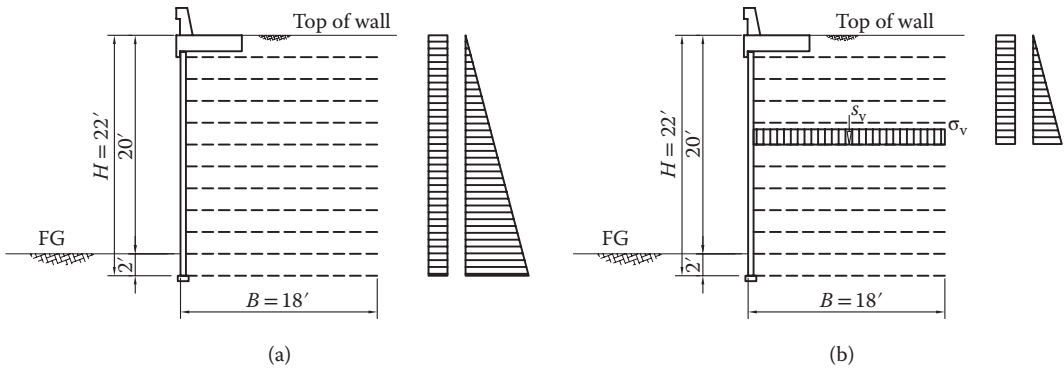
Mechanical stabilized earth (MSE) wall design example.
